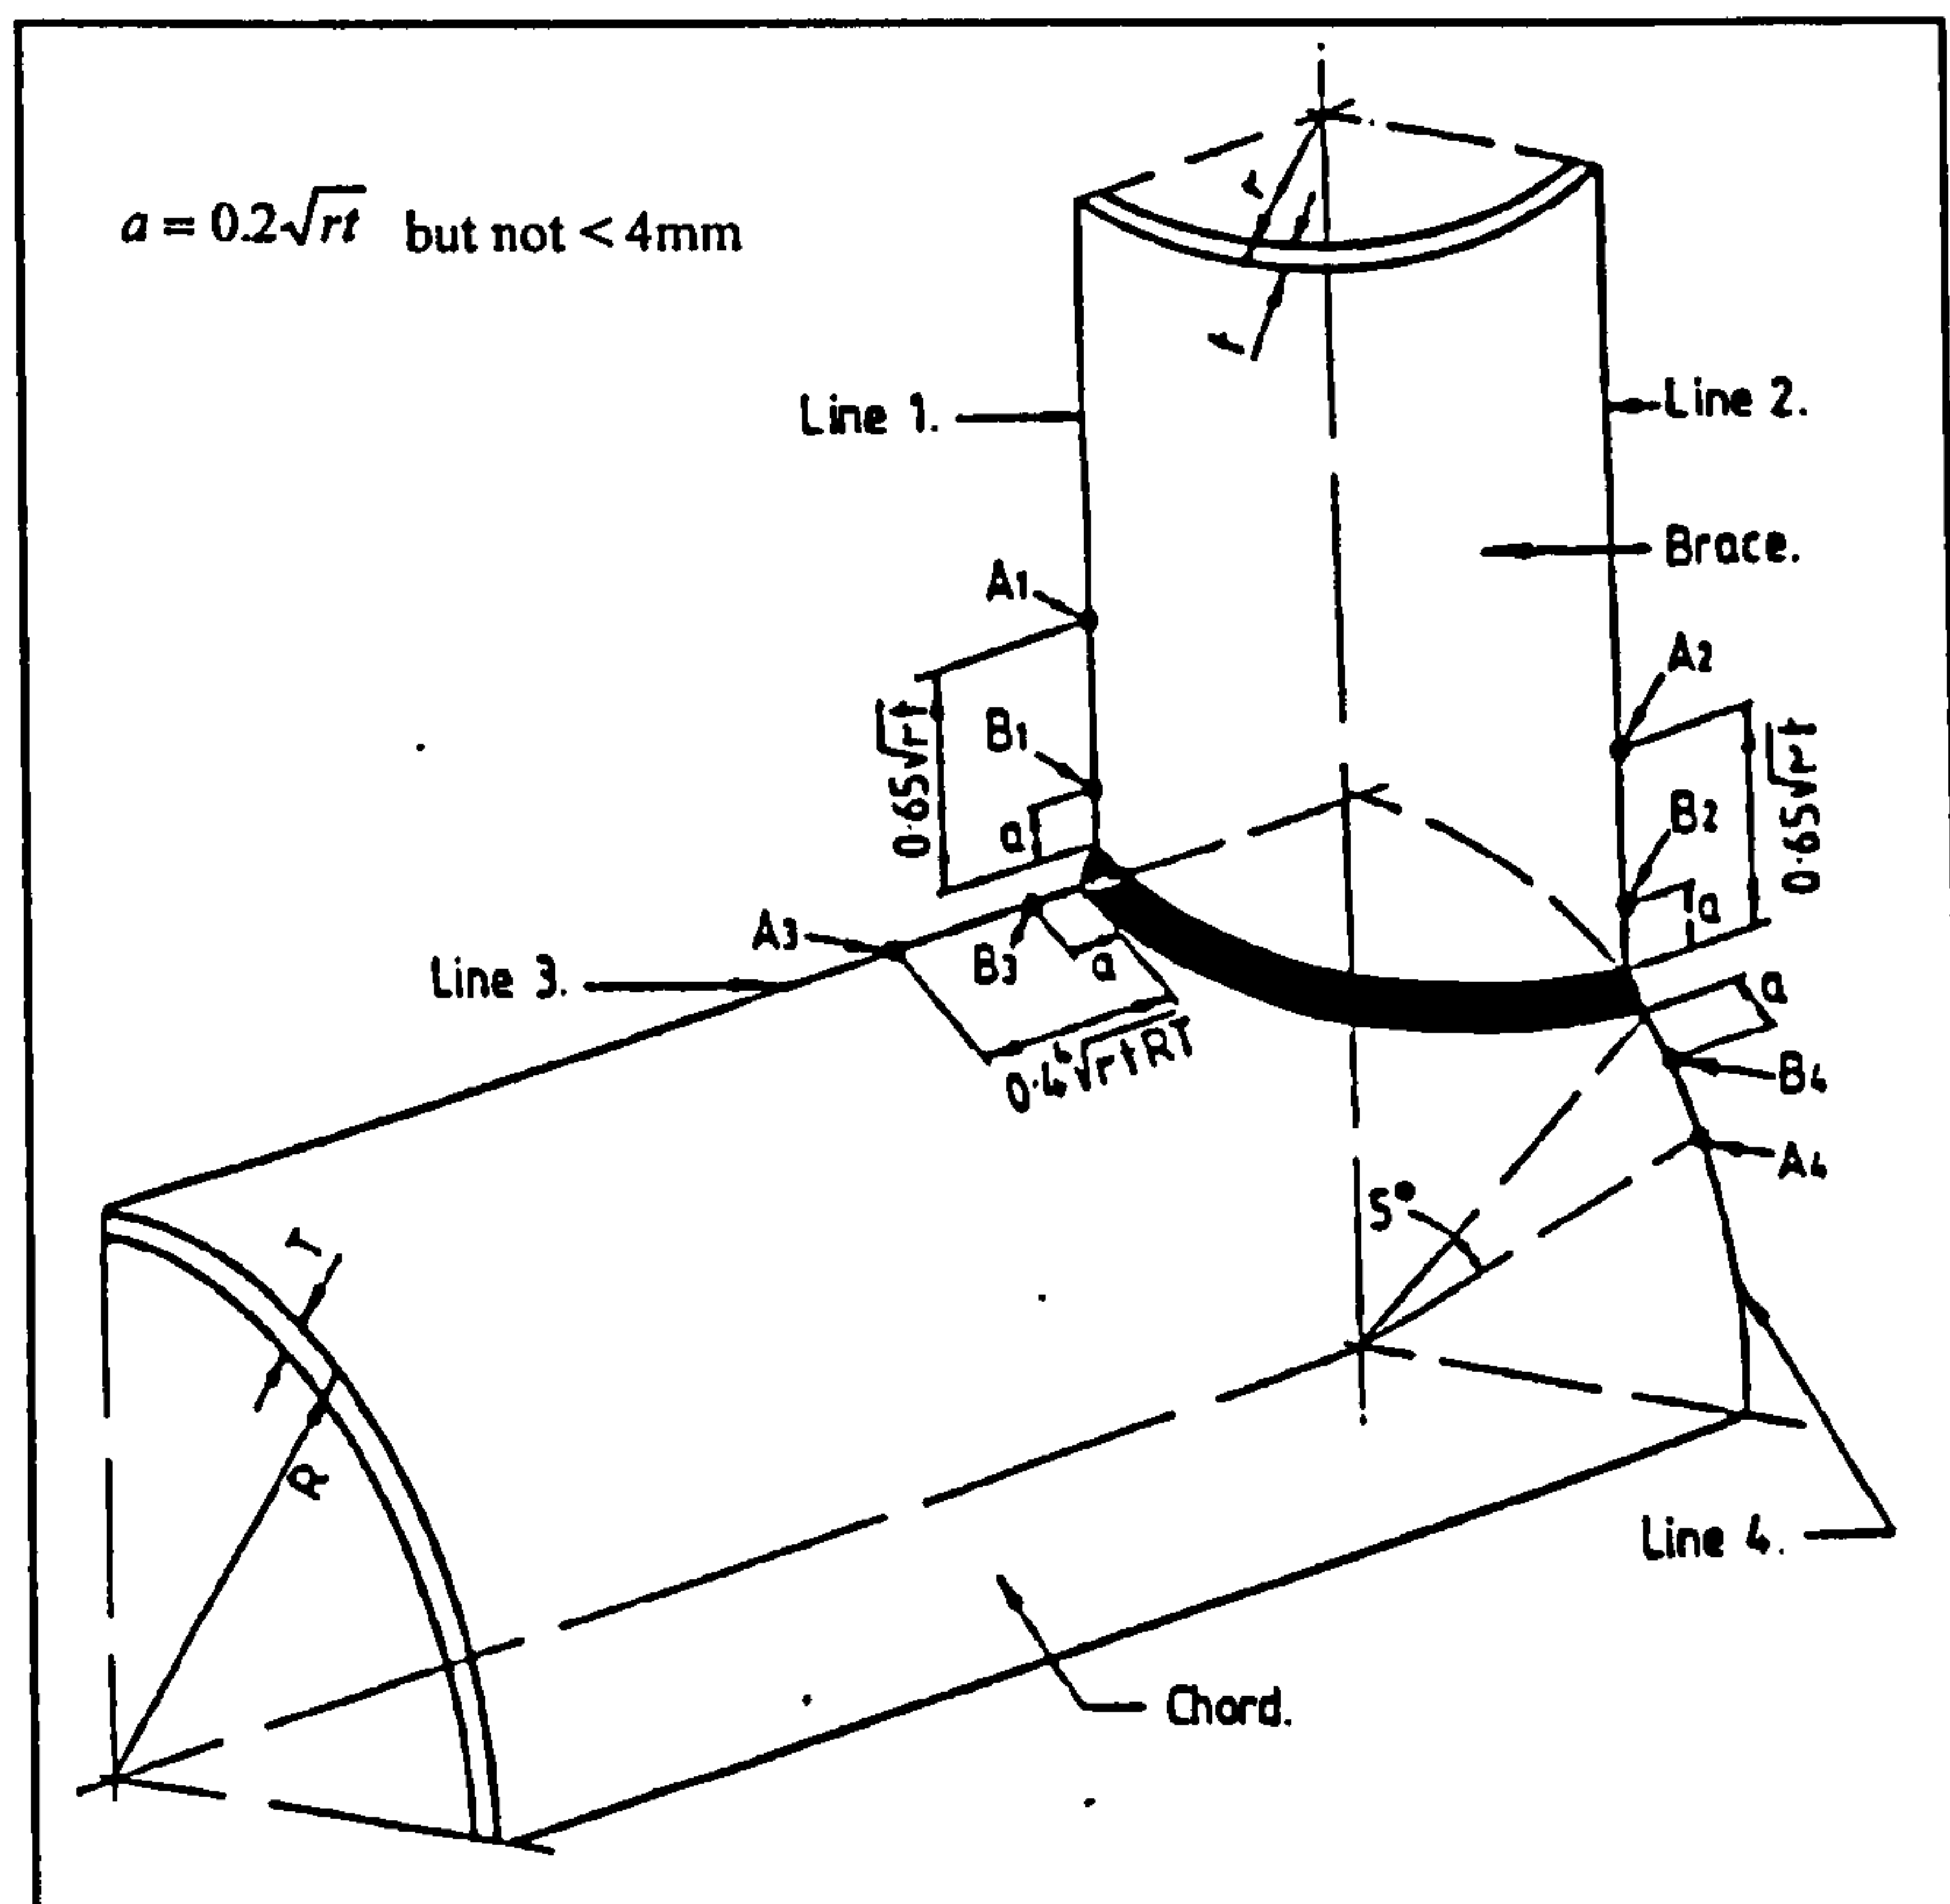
Recommended locations of strain gauges from joint weld toe [1.49]
